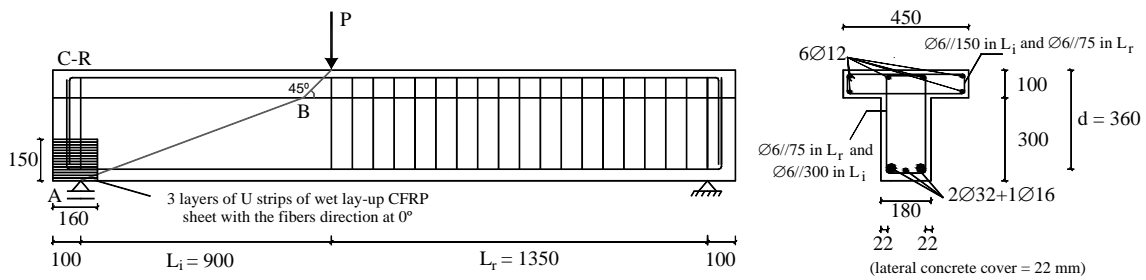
Tested beams: geometry, steel reinforcements applied in all beams and CFRP-based strengthening configuration of the most loaded beam support (dimensions in mm)
